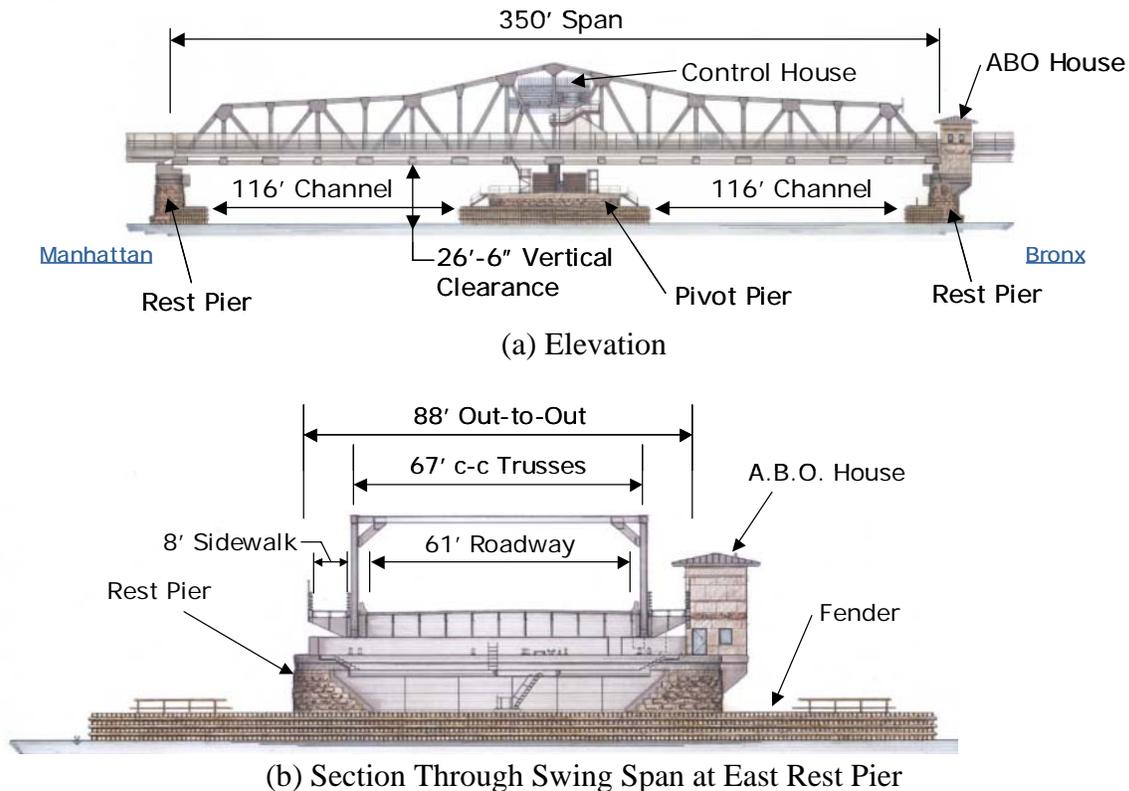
Rendering of New Third Avenue Bridge Swing Span
